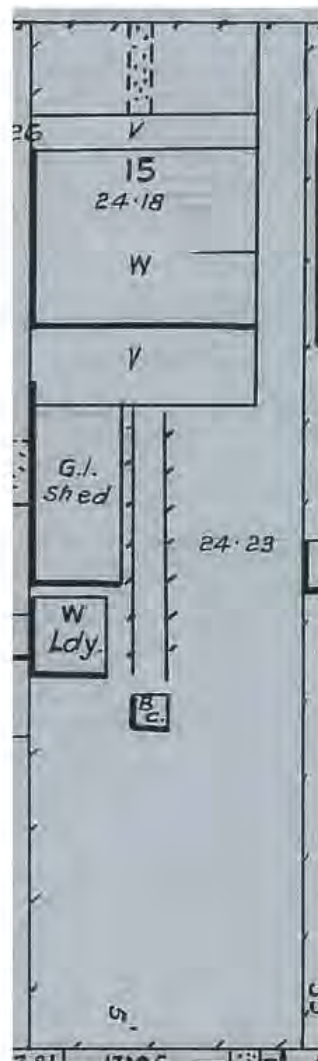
1908 SEWERAGE PLAN DETAIL
